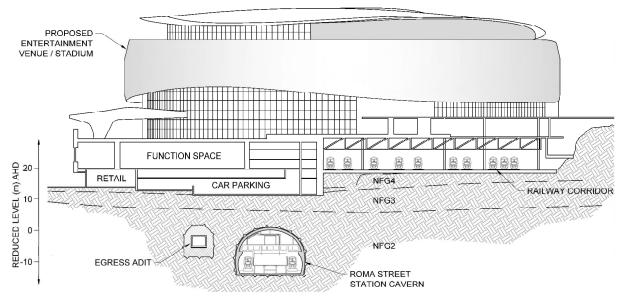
Concept arrangement of the proposed entertainment venue and stadium overlying Roma Street cavern.
